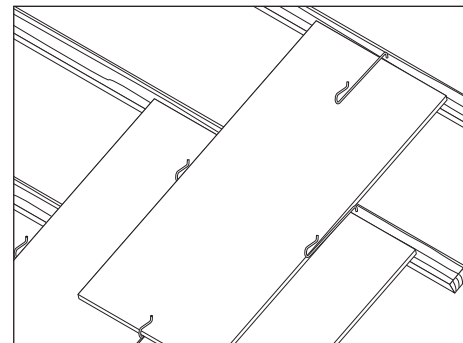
Hook fixed fibre cement slates secured in four positions
